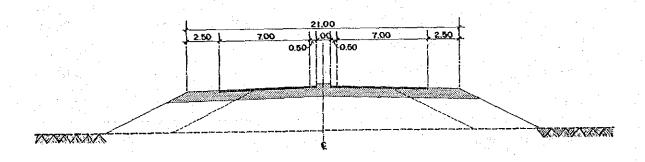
TYPICAL CROSS SECTION FOR FOUR LANE ROAD (WIDENING)
